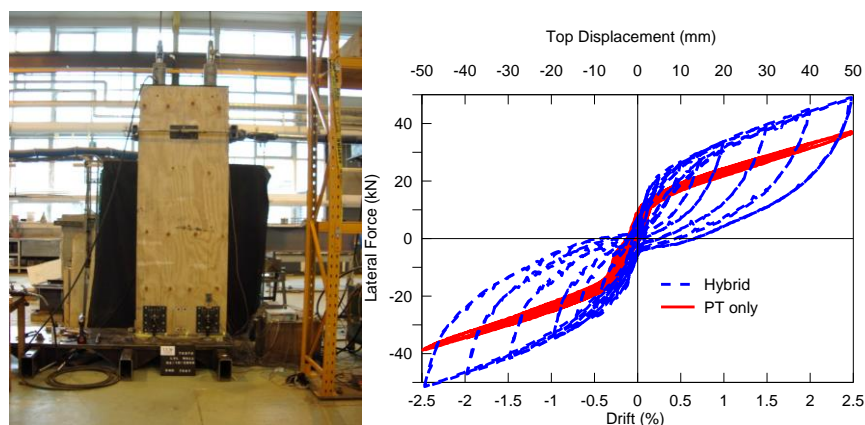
Wall-foundation test specimen and load-deflection plot (Smith et al. 2007)
